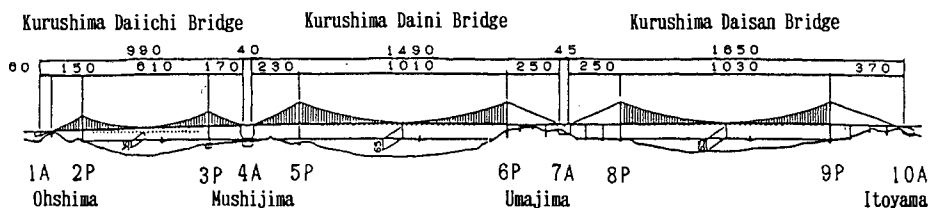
Outline of Kurushima Kaikyo Bridge (unit:m)
